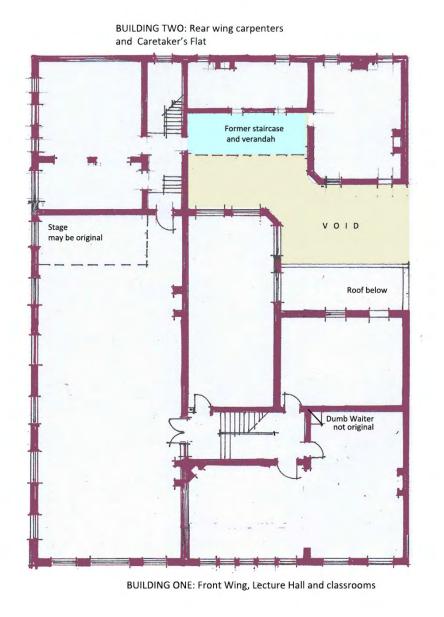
Part 3: Upper floor plan showing remaining original fabric (Sketch BJH April 2014)
